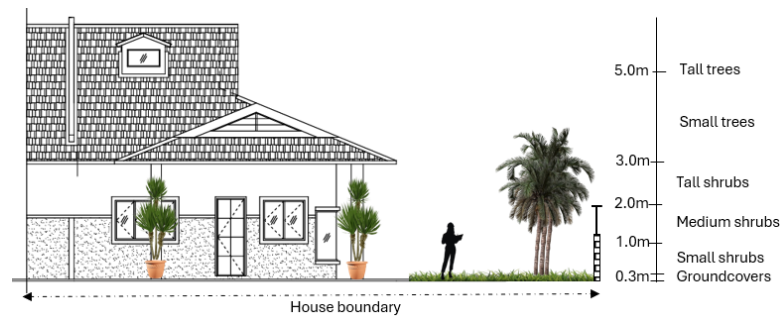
Front Elevation of SSLH showing two *Yucca aloifolia* in pots (2–3 m), providing minimal shading to ground-level cooling
